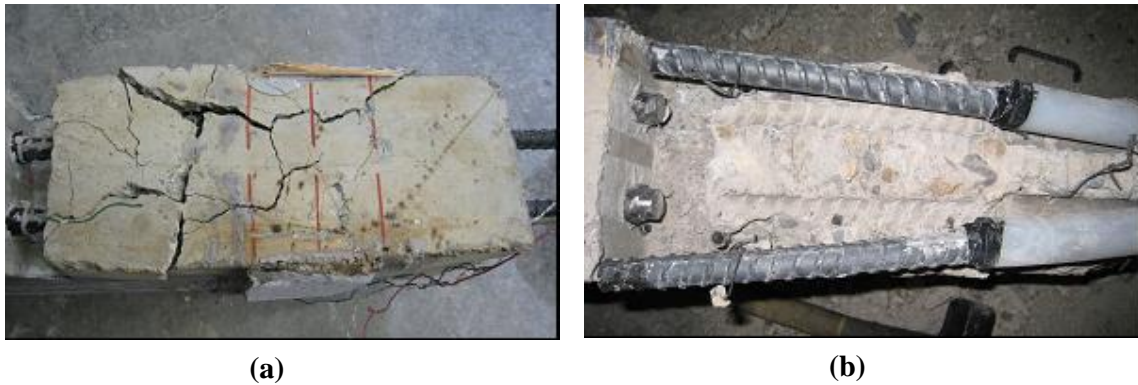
(a) the cracks after failure in the bonded region of beam F-200-U-n-70-1. (b) intact concrete above the bar in Beam F-200-U-n-70-2. The beam was turned upside-down.
